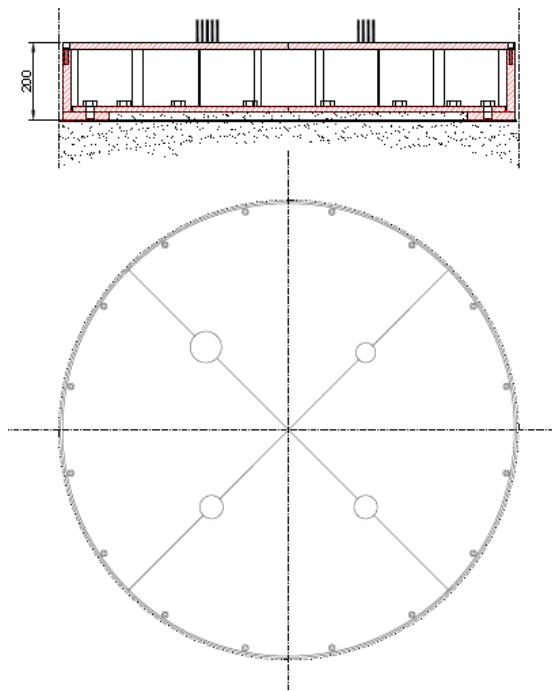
Scheme of the top plate of the cables sealing lid below the confining tube in Shaft 2
